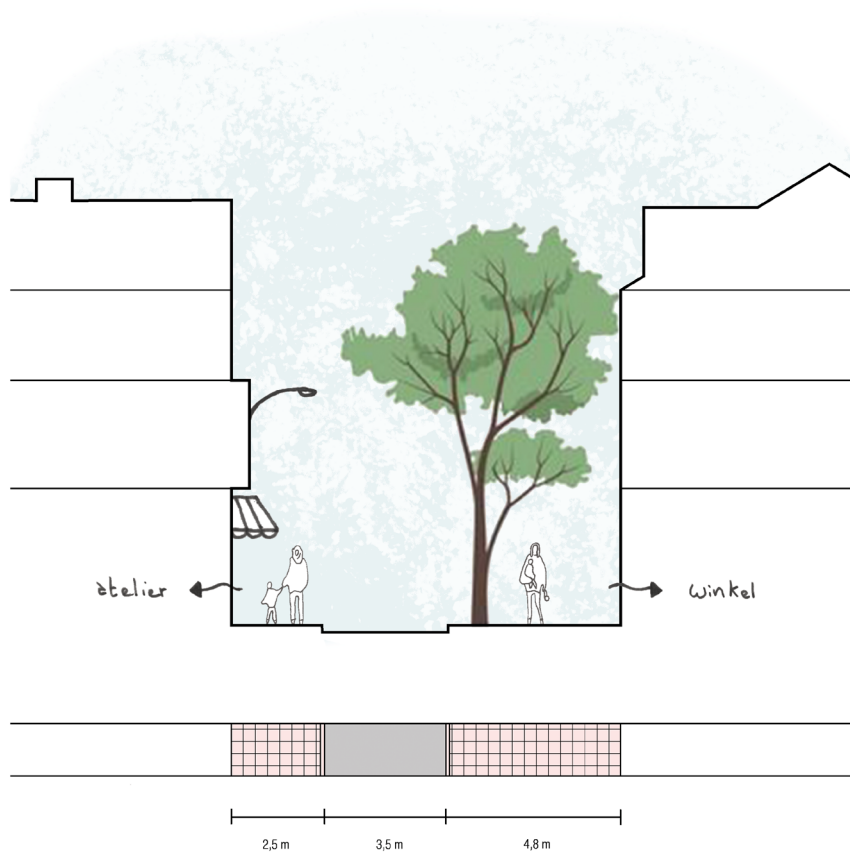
Section of the new lay-out of Rue Puits-en-Stock
